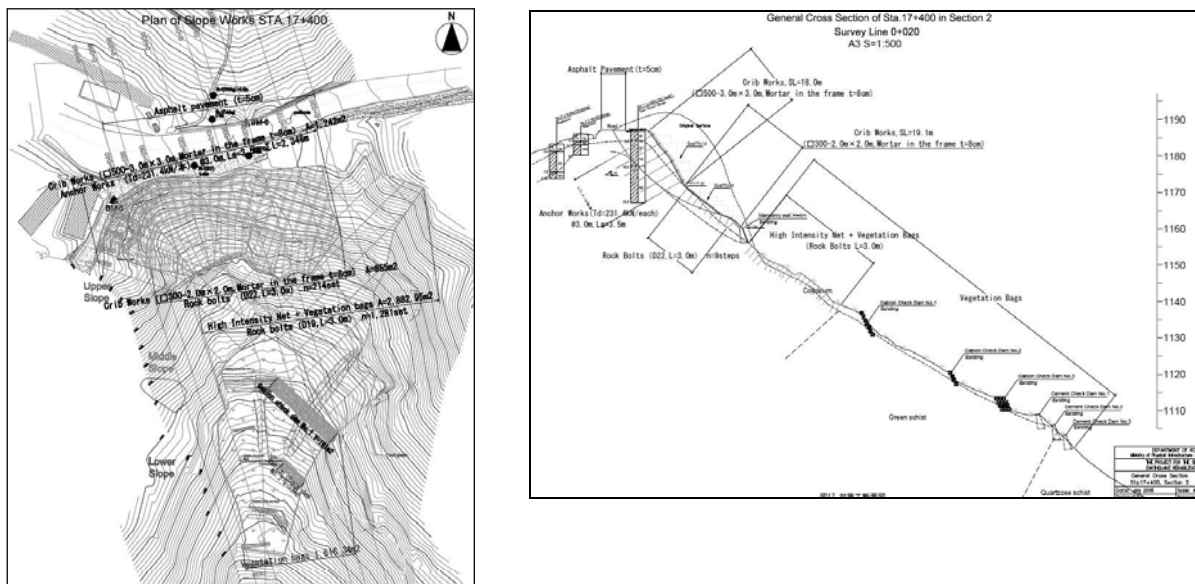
General Plan and Cross Section of the Proposed Countermeasures (Sta. 17+400)
